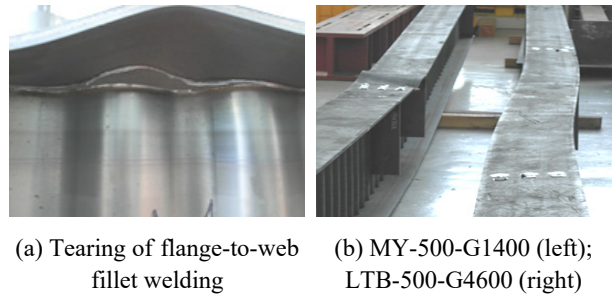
Weld tearing and LTB observed in specimens subjected to linear moment gradient
